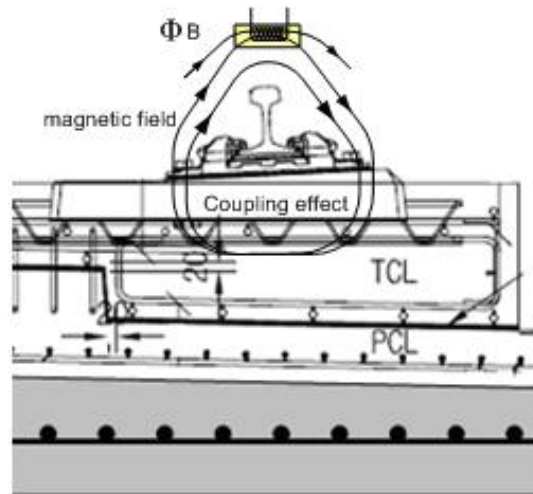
Interaction between the concrete slab rail and track circuit [2]
